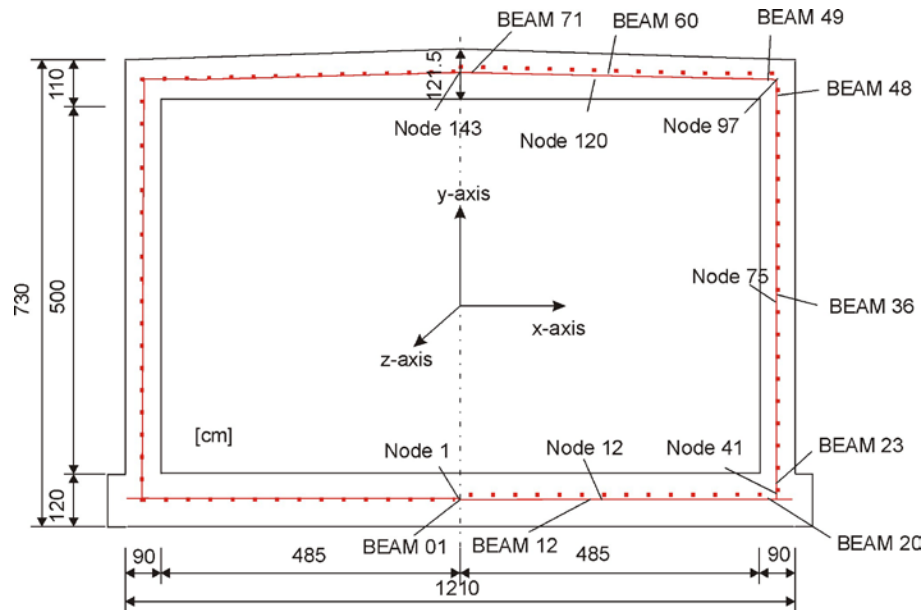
Principle sketch of the road tunnel according to [L151]
